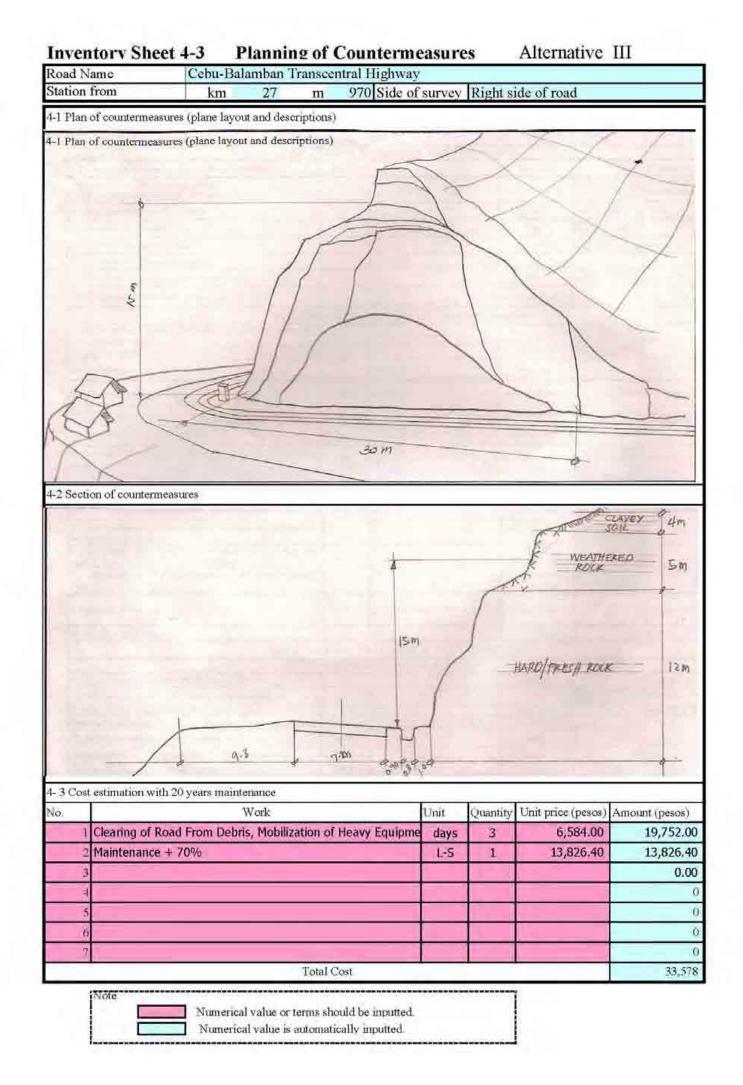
Example of Inventory Sheet 4-3: Planning of Countermeasure Alternative III for Rock Slope Collapse
